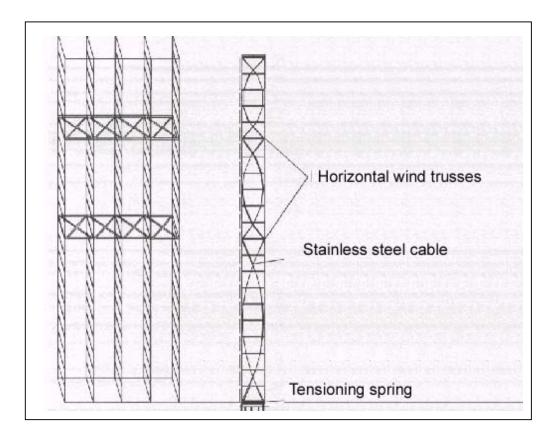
Sketch drawing of hybrid-supported glass façade. Source: Kallioniemi ,1999
